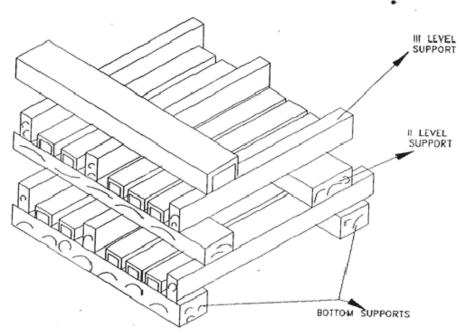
STRUCTURAL STEEL STACKING ARRANGEMENT
